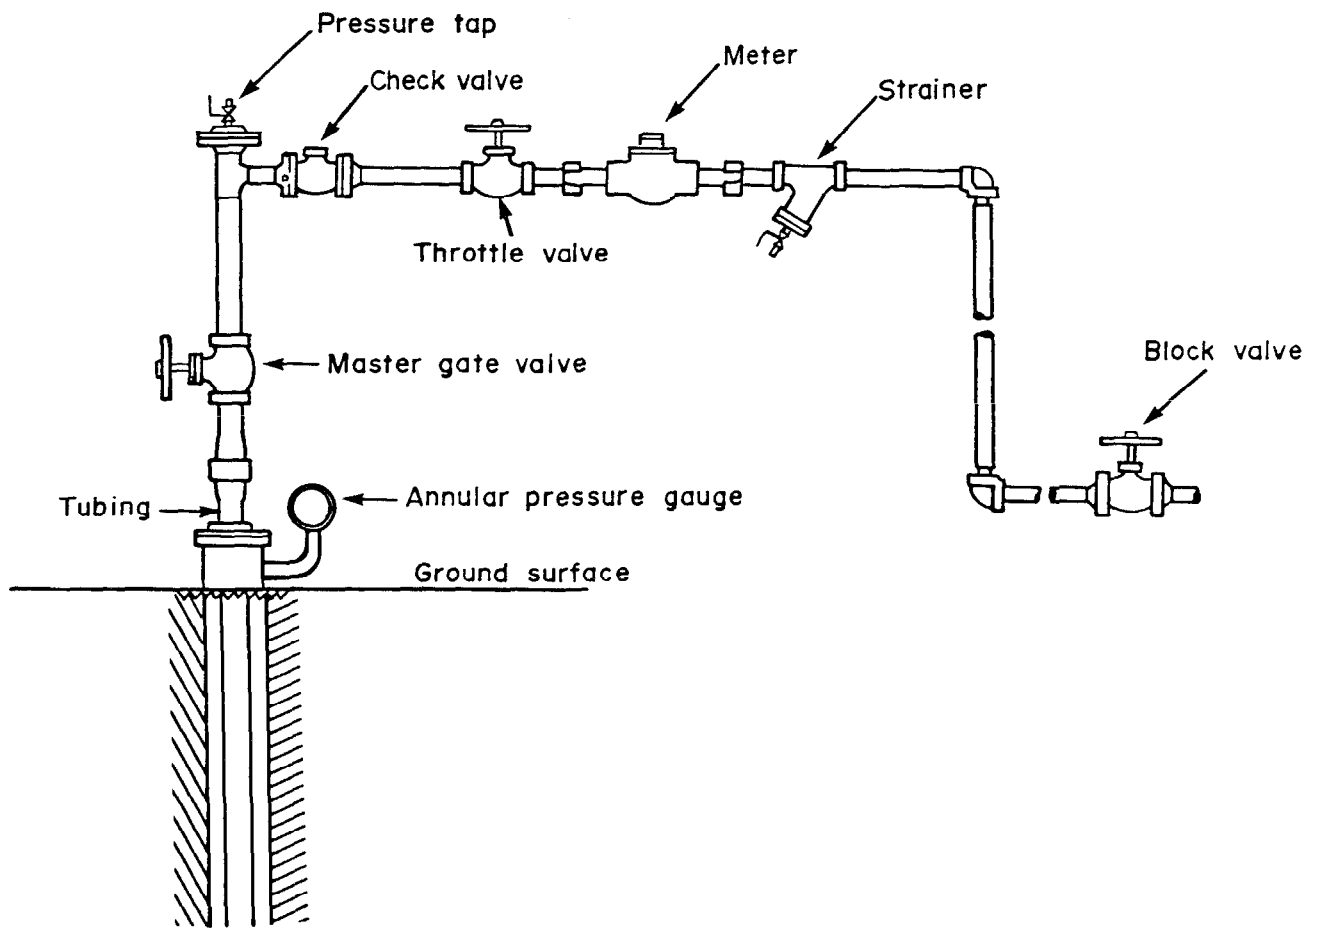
Simplified wellhead assembly showing meters and valves (API, 1978)
